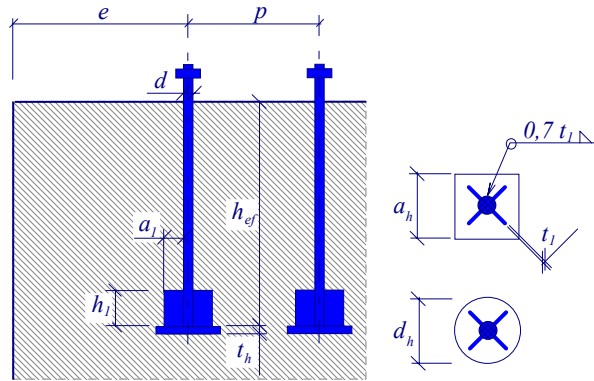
Geometry of cast-in-situ headed anchor bolt
